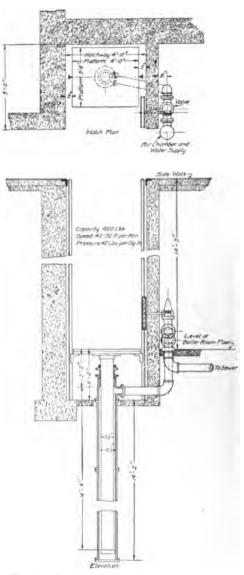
Section of Plunger Hydraulic Elevator, Showing Details of Construction Courtery of Kaestner and Hecht Company, Chicago
